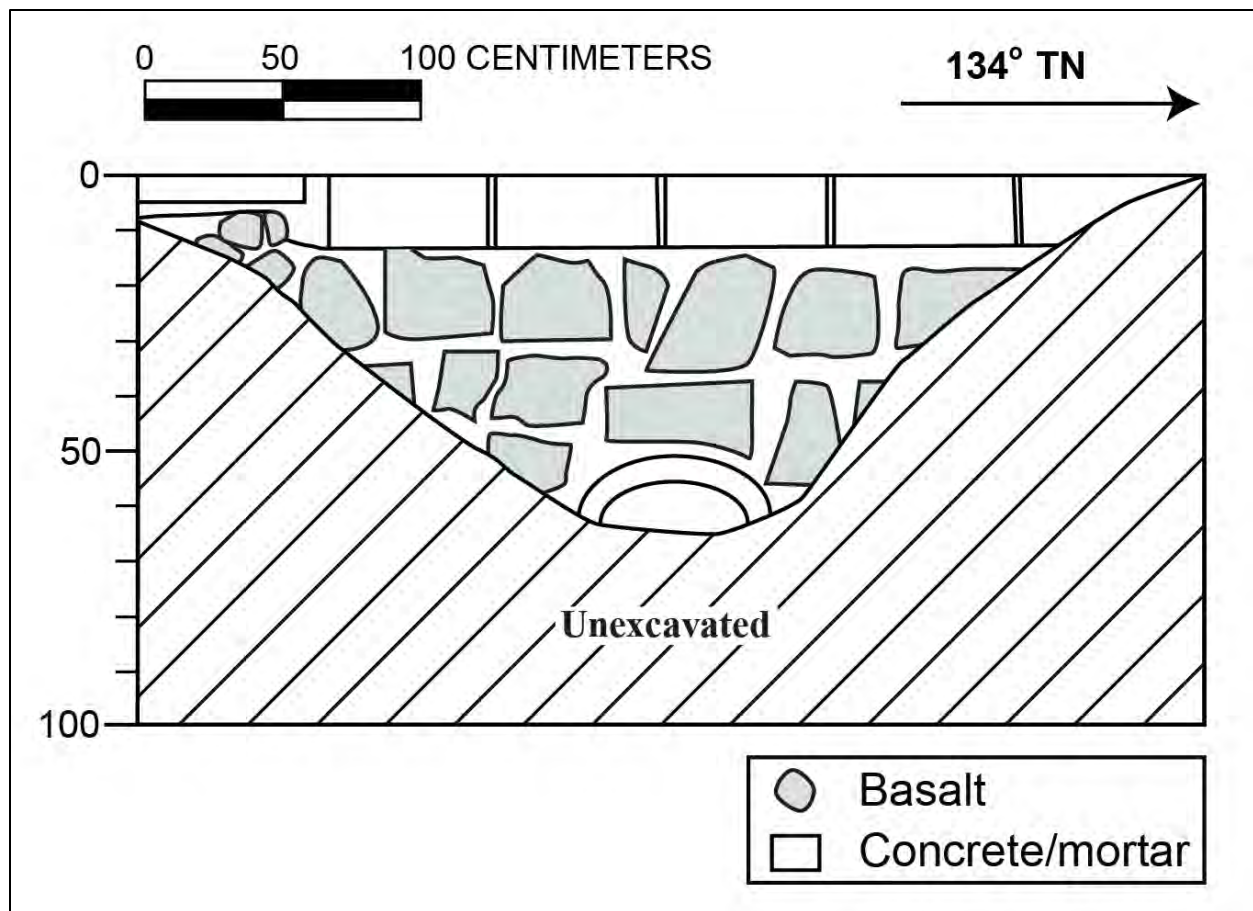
SIHP # 50-80-09-2268 Feature E southwest face of culvert profile
